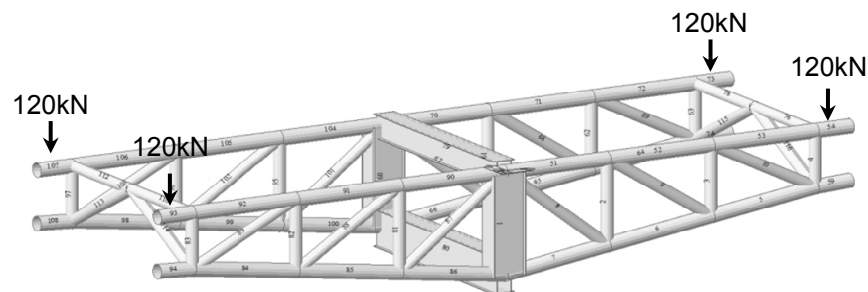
Loading of negative bending moment on continuous supporting points of CFT truss girder bridges test model.
